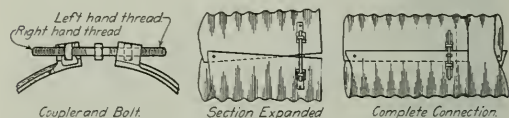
Details of the Coupler and Bolt Used to Connect Sections of Corrugated Iron Culverts and Sketches Showing the Method of Applying It
